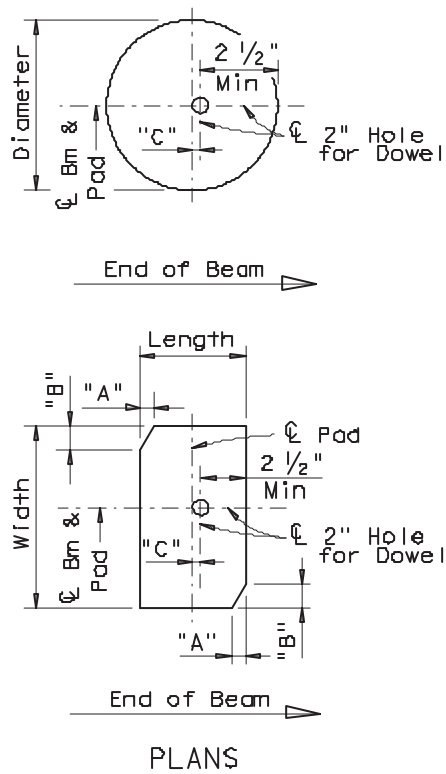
Bearing Pad Plan Dimensions from the IGEB and IBIB Standards
